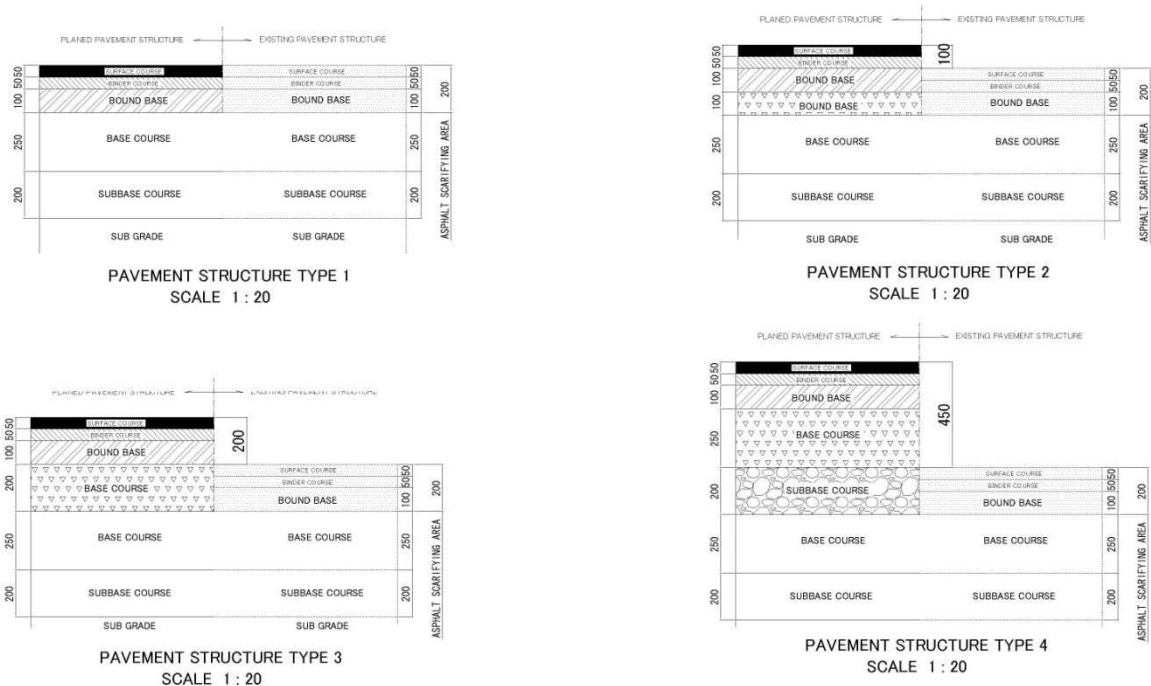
Types of Pavement Structure of the Sections to be Raised (2)
